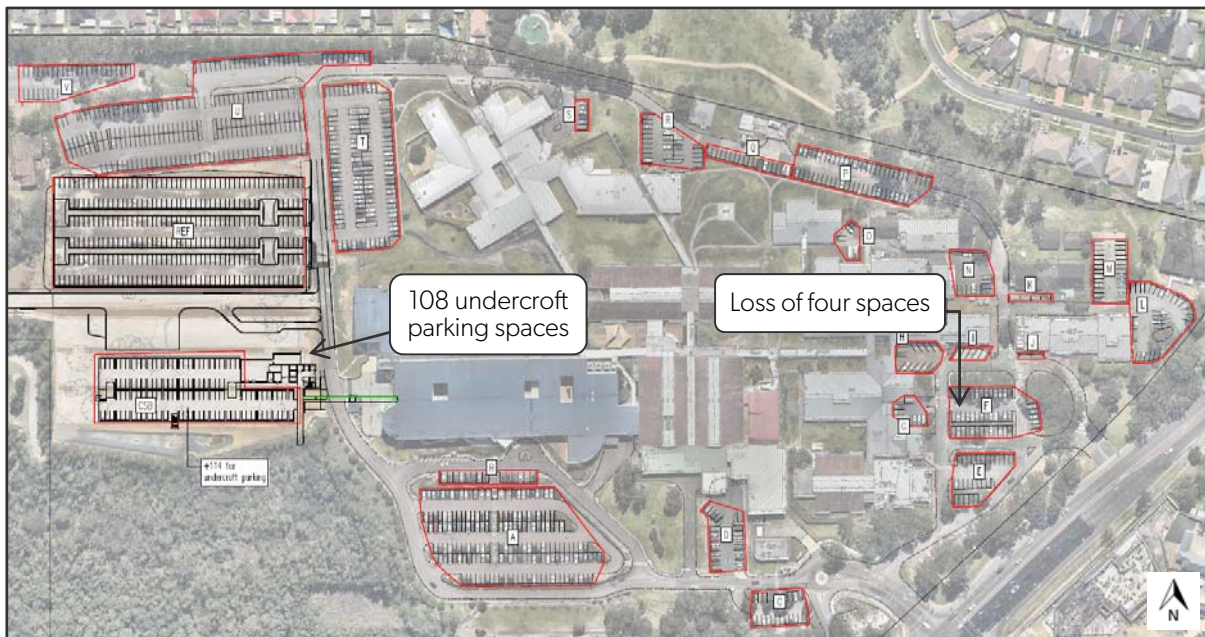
| Existing and proposed car parking on-site (Source: Applicant’s EIS)
